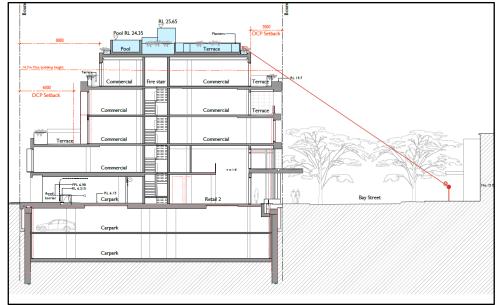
Section showing sightline to proposed planters. Source: Lawton Hurley. Sightline added by: WMC
